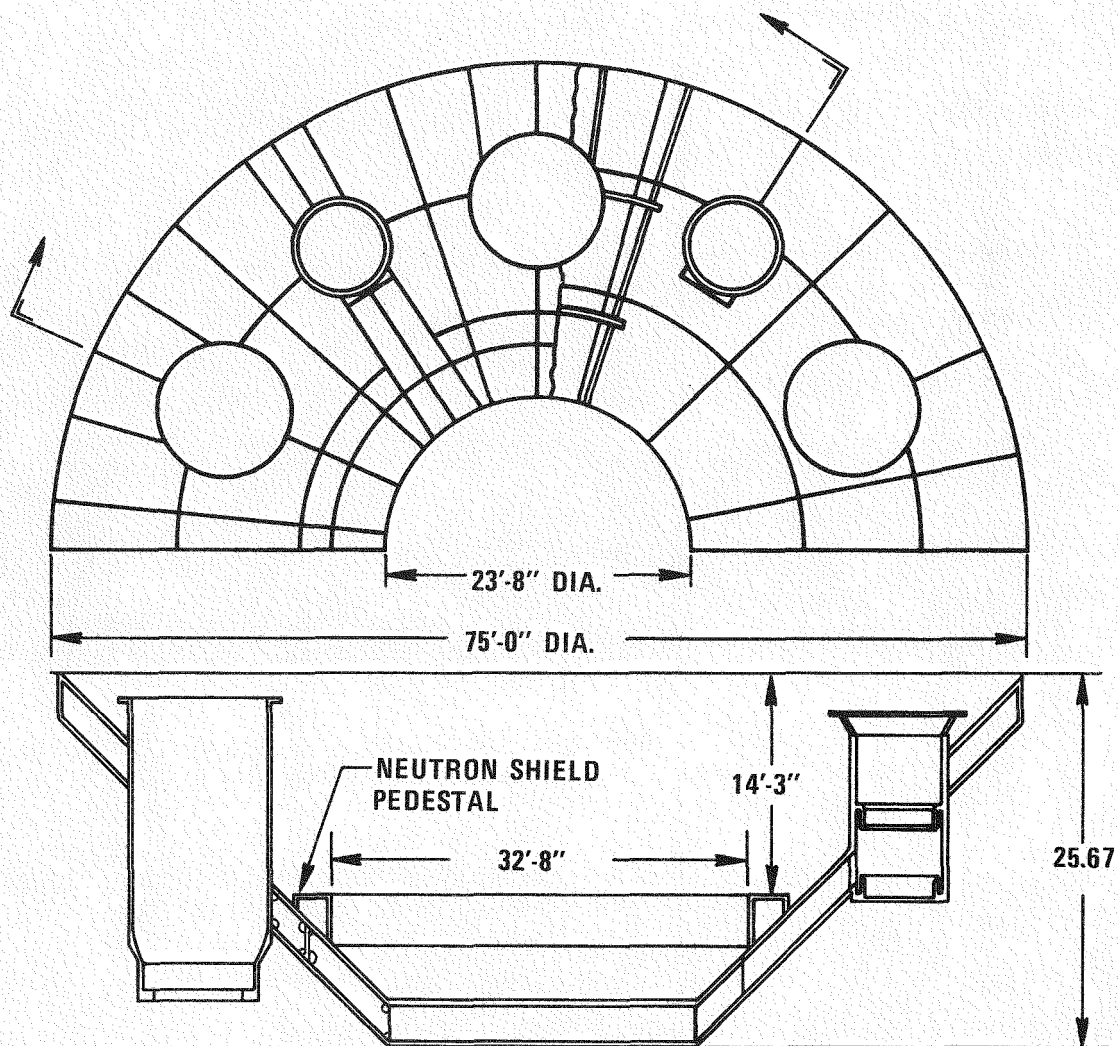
Lower Support Structure Supplied in Sections per Figure 4-2
